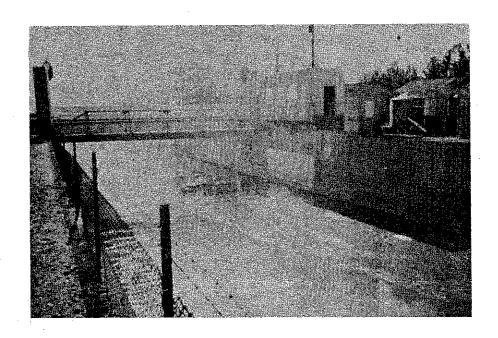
Photograph of Pacoima Spreading Grounds Diversion Structure, Looking Downstream.
